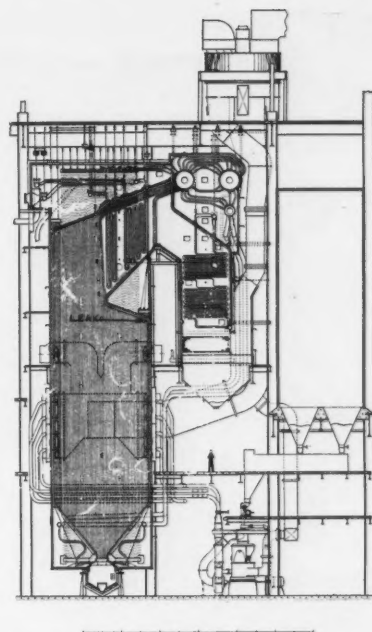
C. E. boiler dry ash removal (Drawing courtesy of Combustion Engineering, Inc.).
